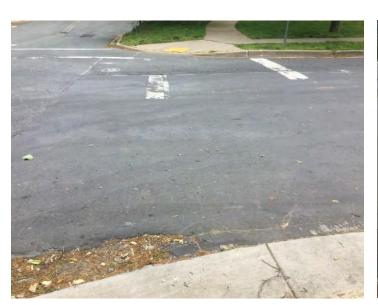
A typical crosswalk with outdated and faded/missing markings
